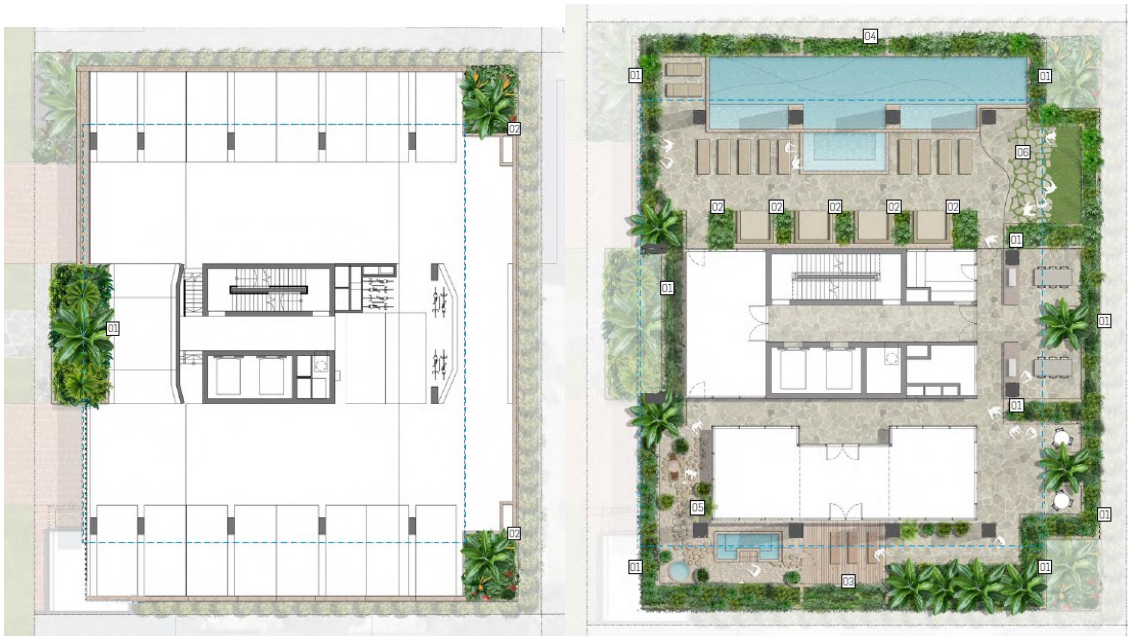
Level 2 (left) and Level 4 (right) Landscape Concept Plan (Source – Rothelowman)
